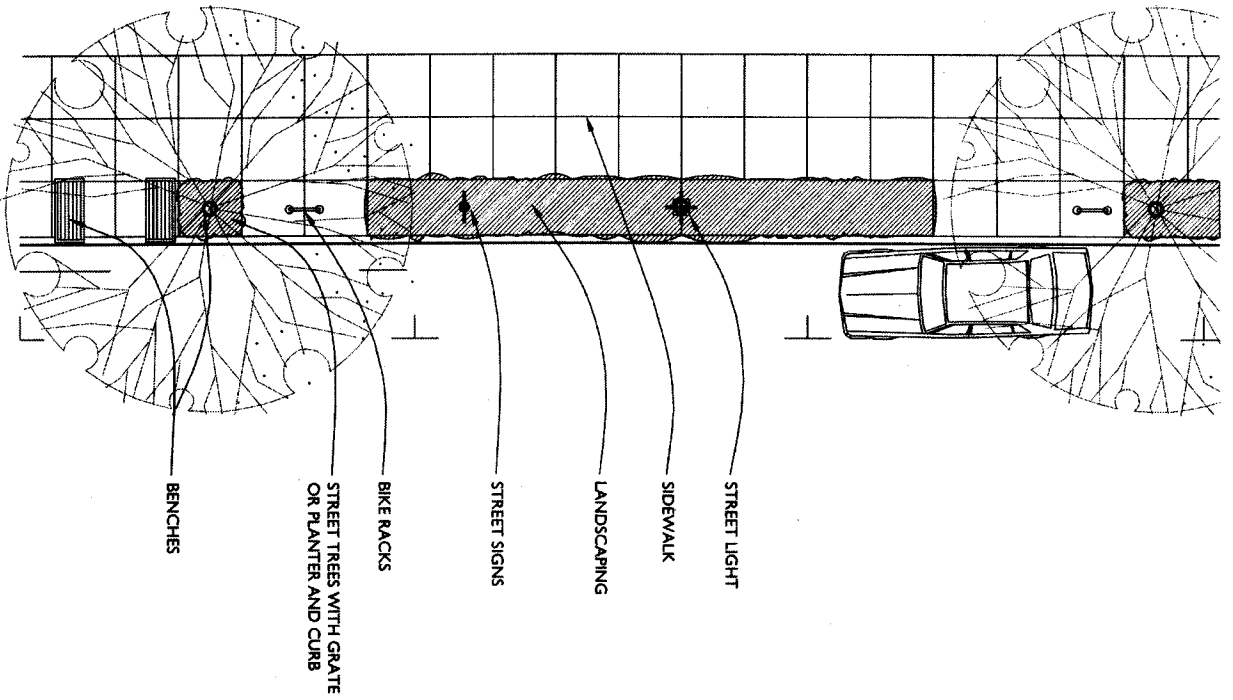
PLANTING POCKETS ALONG ROADWAYS
